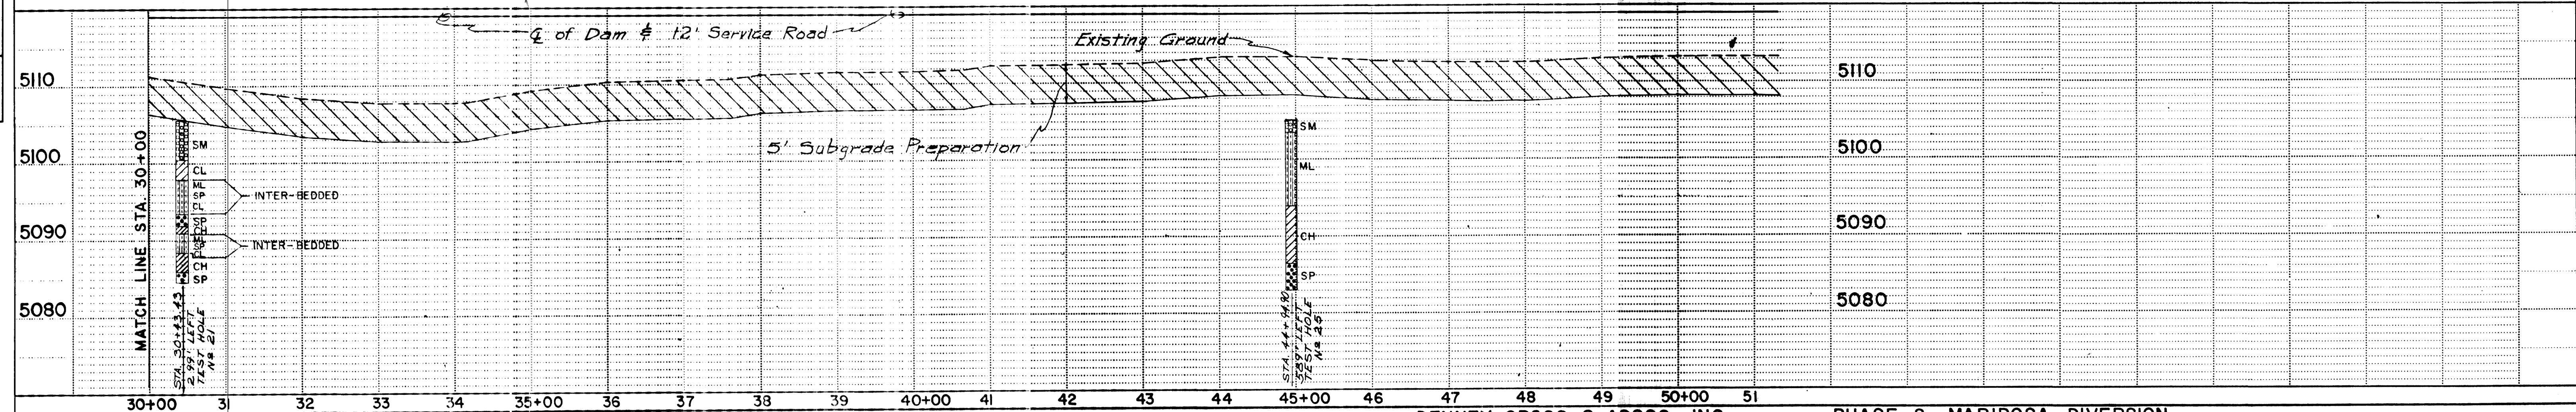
DOUBLE PLAN AND PROFILE-FULL DOT
